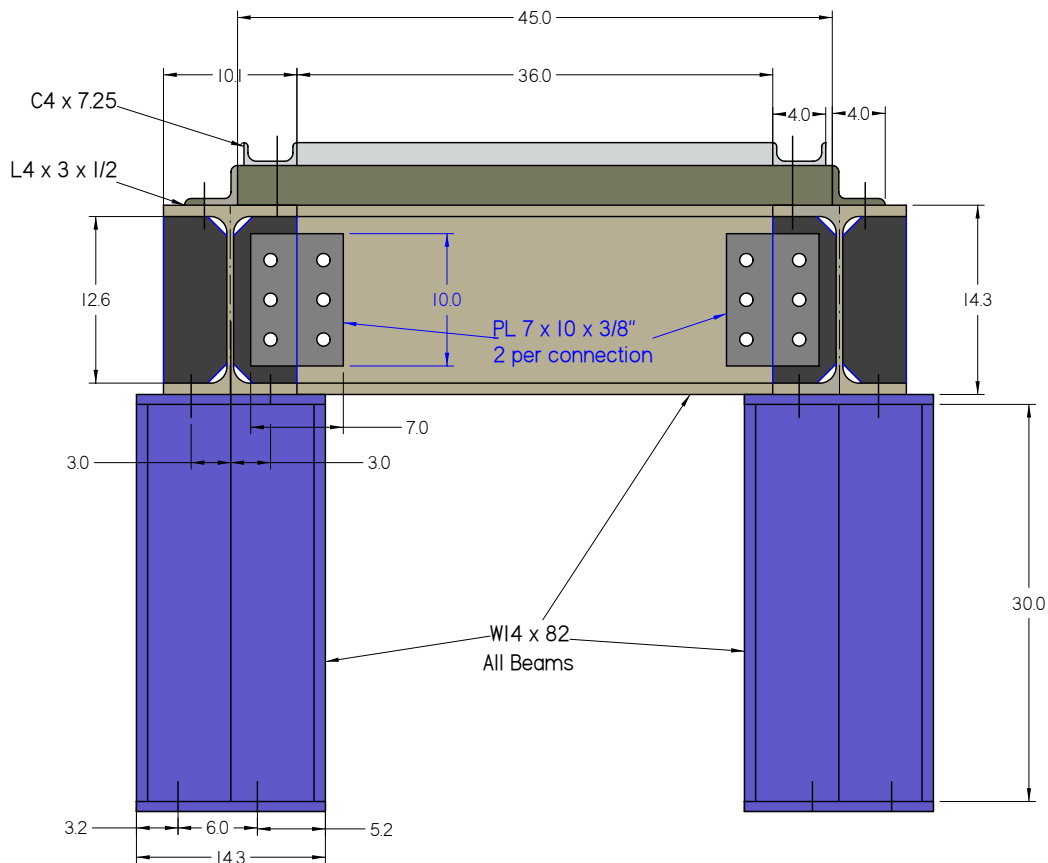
Elevation 1 of Frame (all dimensions in inches)
